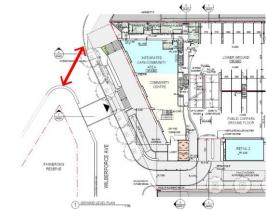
Ground Floor Plan annotated showing the recommended location of pedestrian crossing
